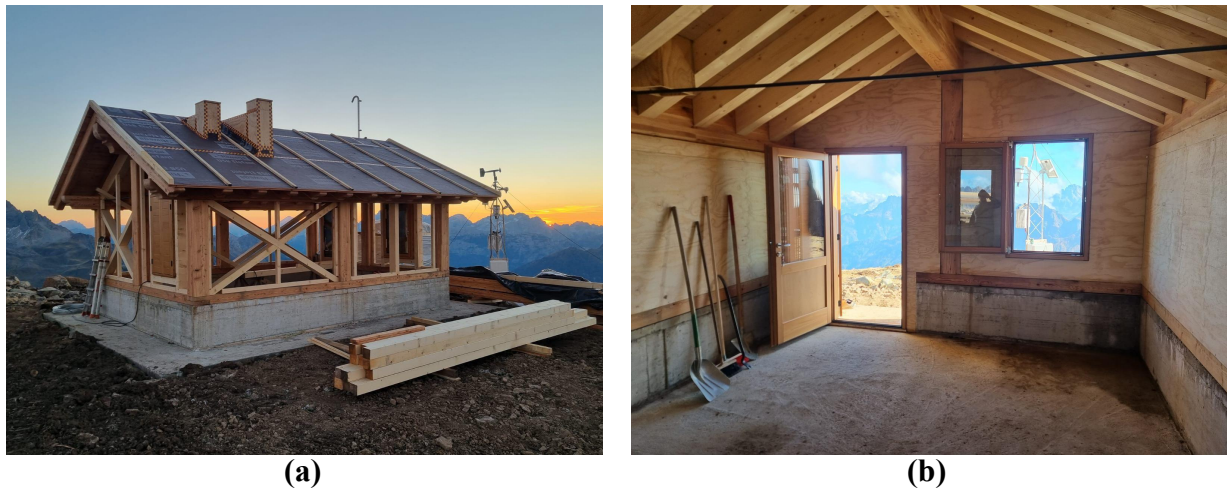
Final stages of the observatory construction. (a) Wooden framework and roof installation. Two of the three rooftop openings for atmospheric gas sampling are visible. A bent pipe for electrical and data raceway installation can be seen in the background. (b) Interior view at the completion of construction. One of the three inner sections of the roof openings is visible on the left.
